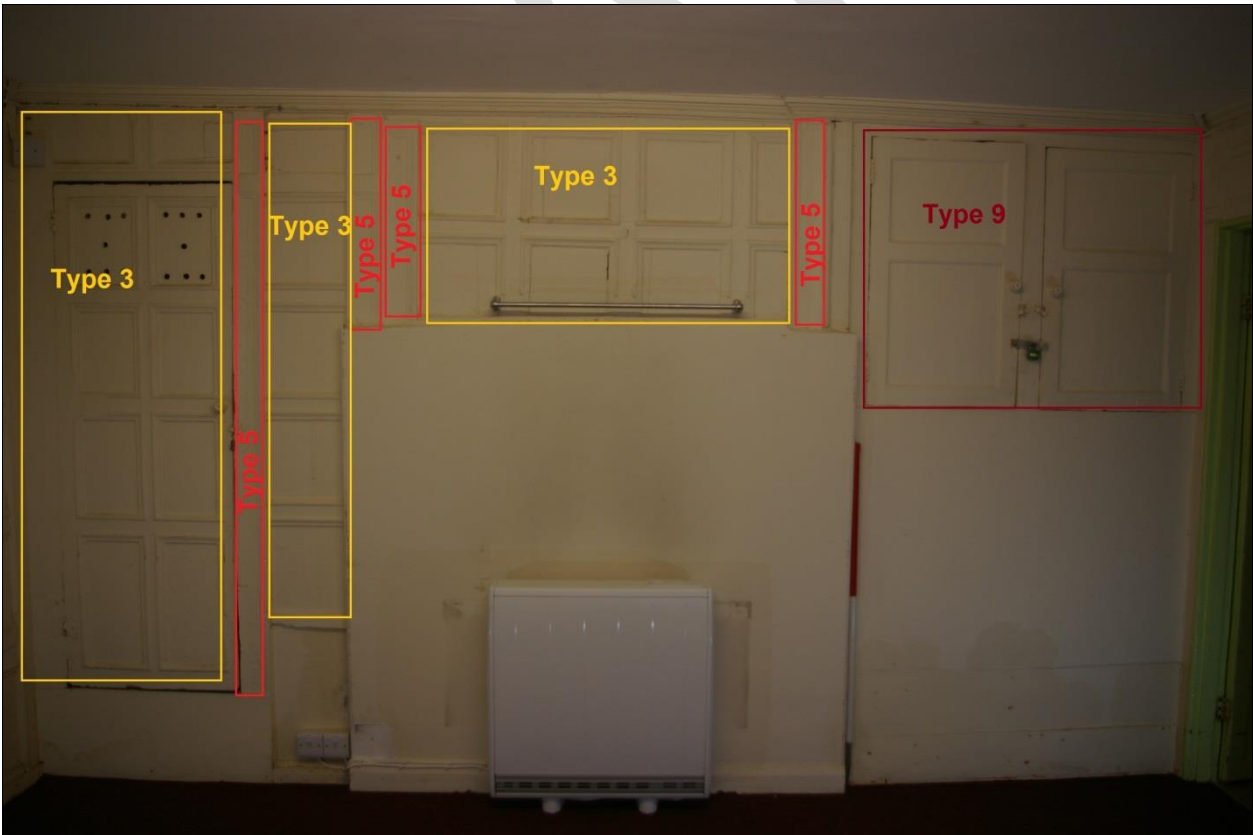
WEST WALL, WITH ANNOTATED PANELLING TYPES.
